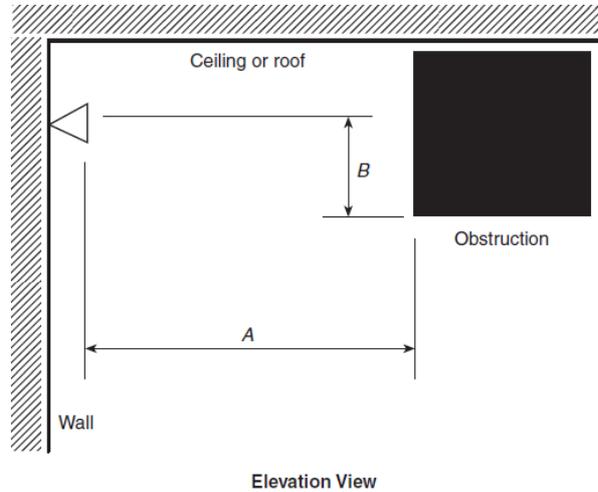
Positioning of Sprinklers to Avoid Obstructions (Residential Sidewall Sprinklers).
